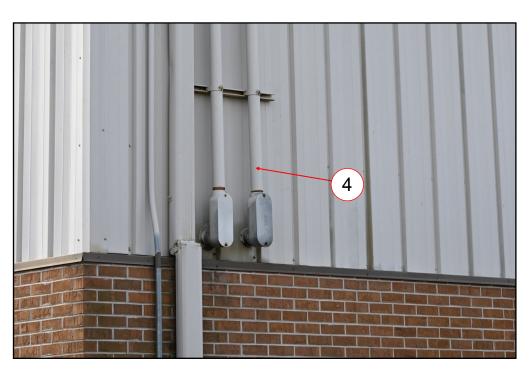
Twin Incoming power feeder conduits penetration point at existing FBO Terminal Building
